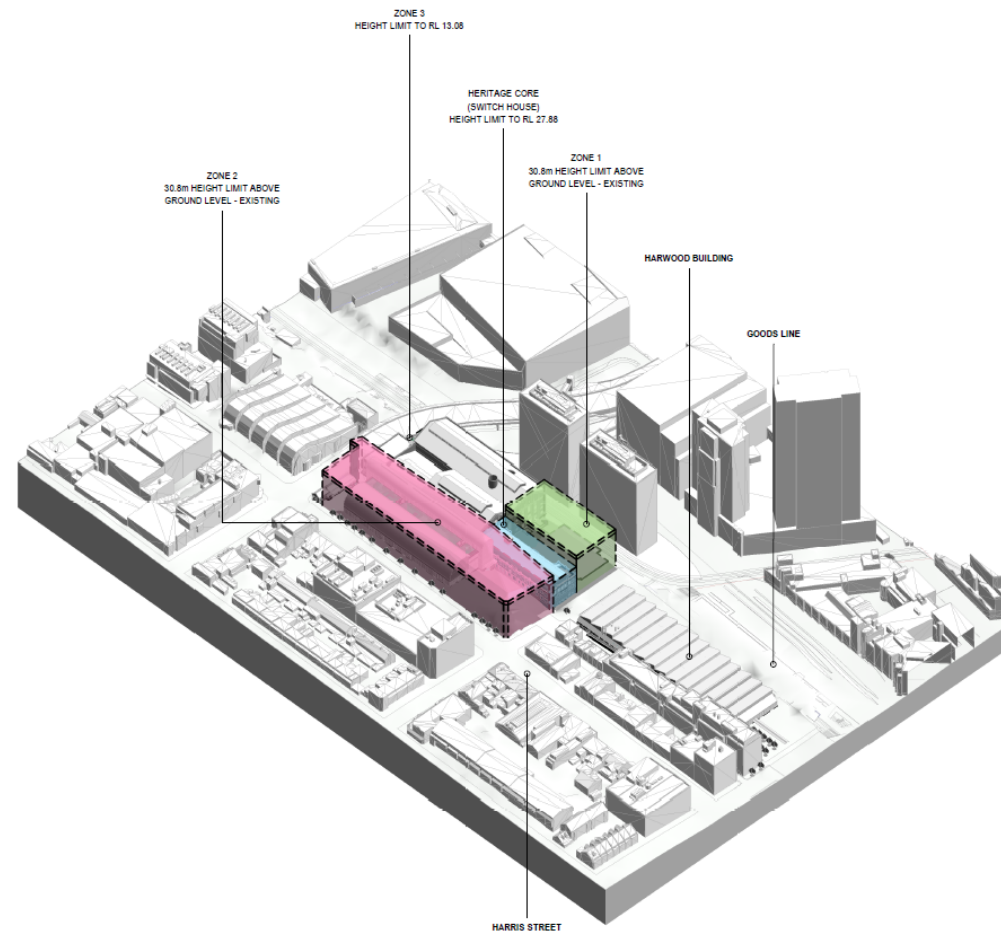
Ultimo Powerhouse- Building Envelope from the SW corner 3D Views (Source: John Wardle Architects, Feb 2022)
